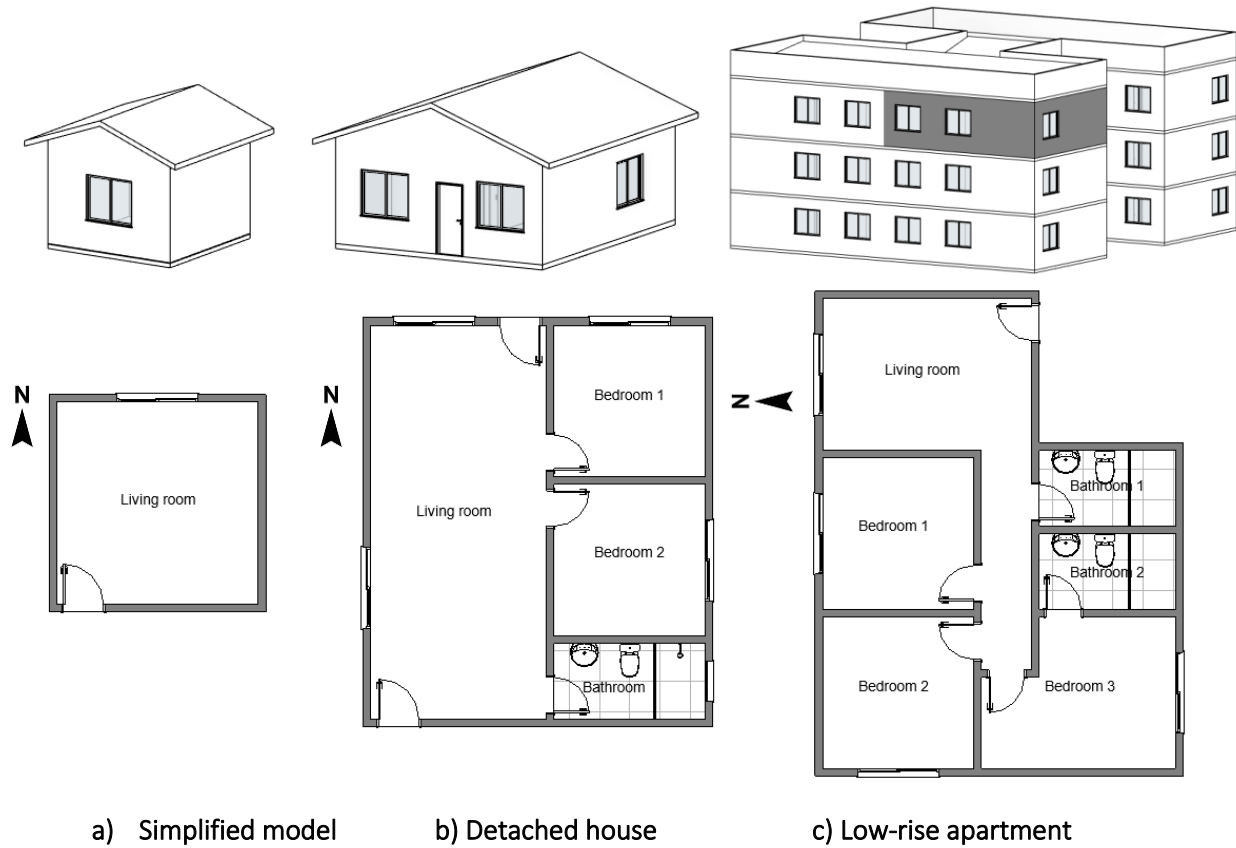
3D views and floor plans for each architectural design analyzed in this study: (a) Simplified model, (b) Detached house, and (c) Low-rise apartment.
